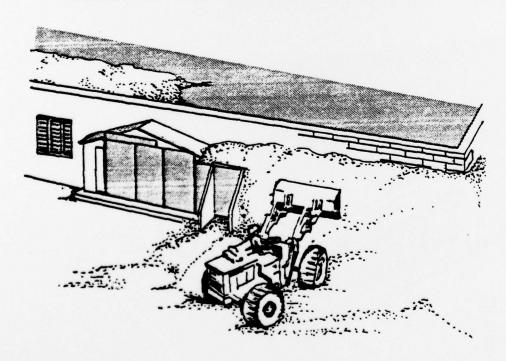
PLACING BERM AROUND EXTERIOR WALLS.
